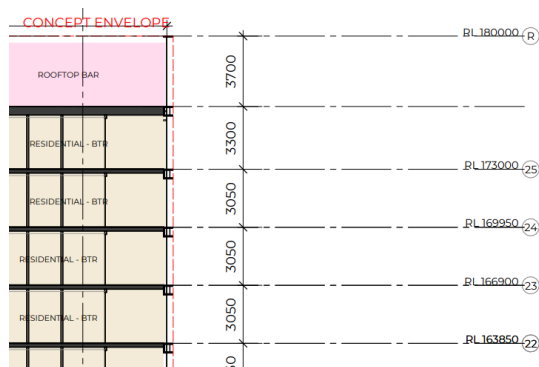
Originally lodged long section showing Level 25 for Tower 1 (Source: Woods Bagot)
